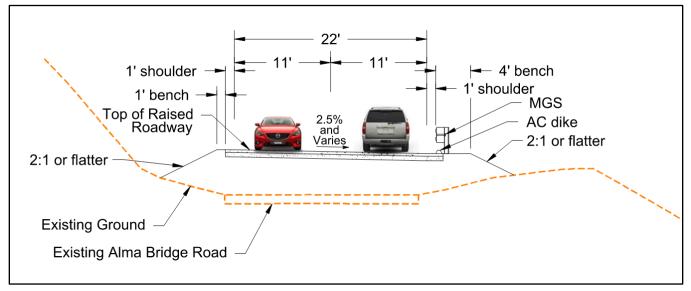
Typical Section #1 - Raised Roadway on Fill (not to scale)
